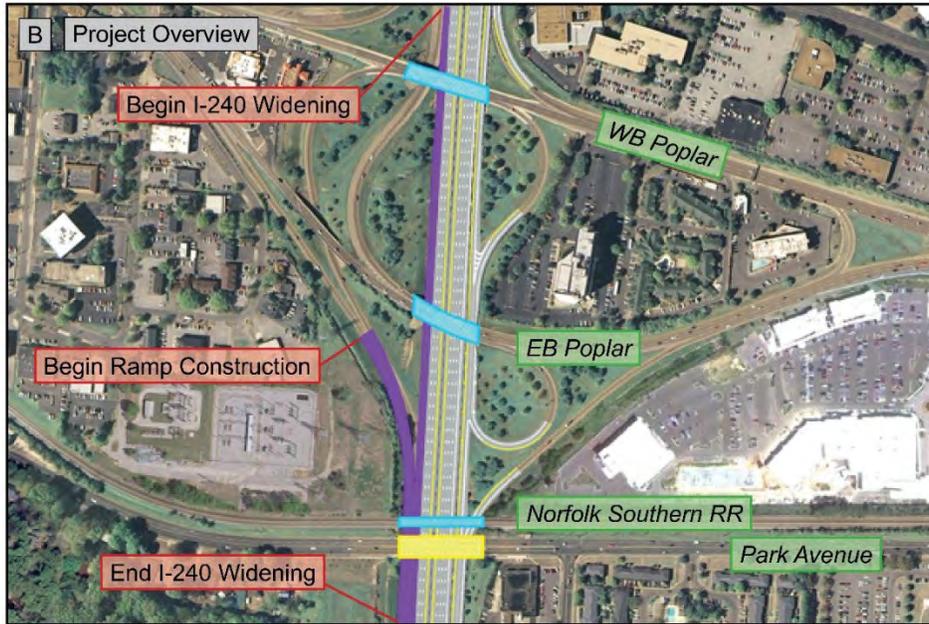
The I-240 corridor surrounds Memphis, TN. The above shows the specific project limits.
